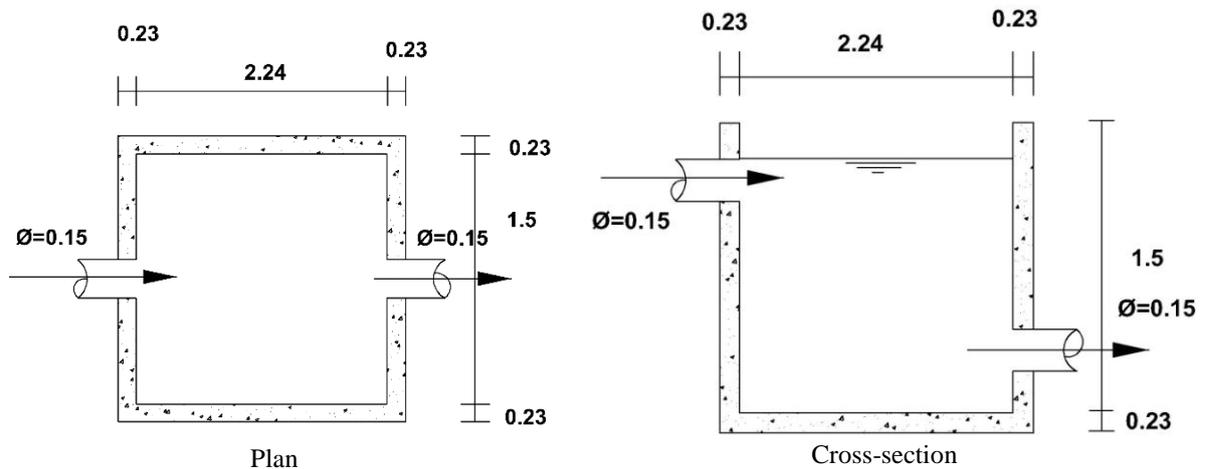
Plan and Cross-section of designed Equalization Tank (dimensions in m, not up to the scale)
